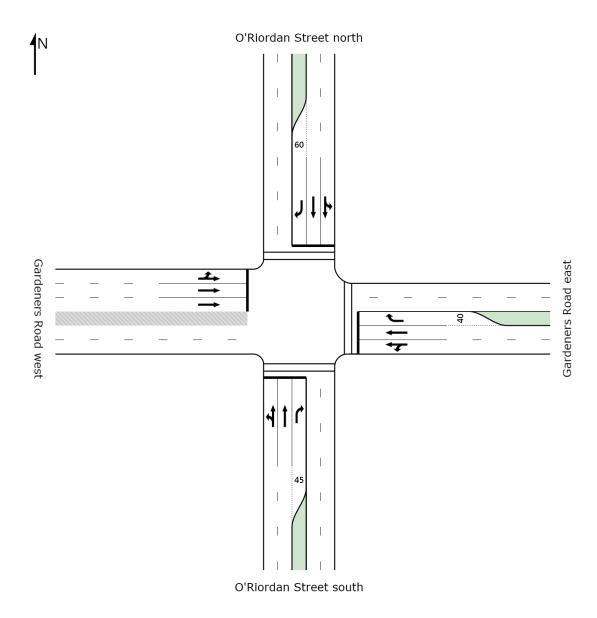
Intersection Layout of O'Riordan Street with Gardeners Road (SIDRA)
